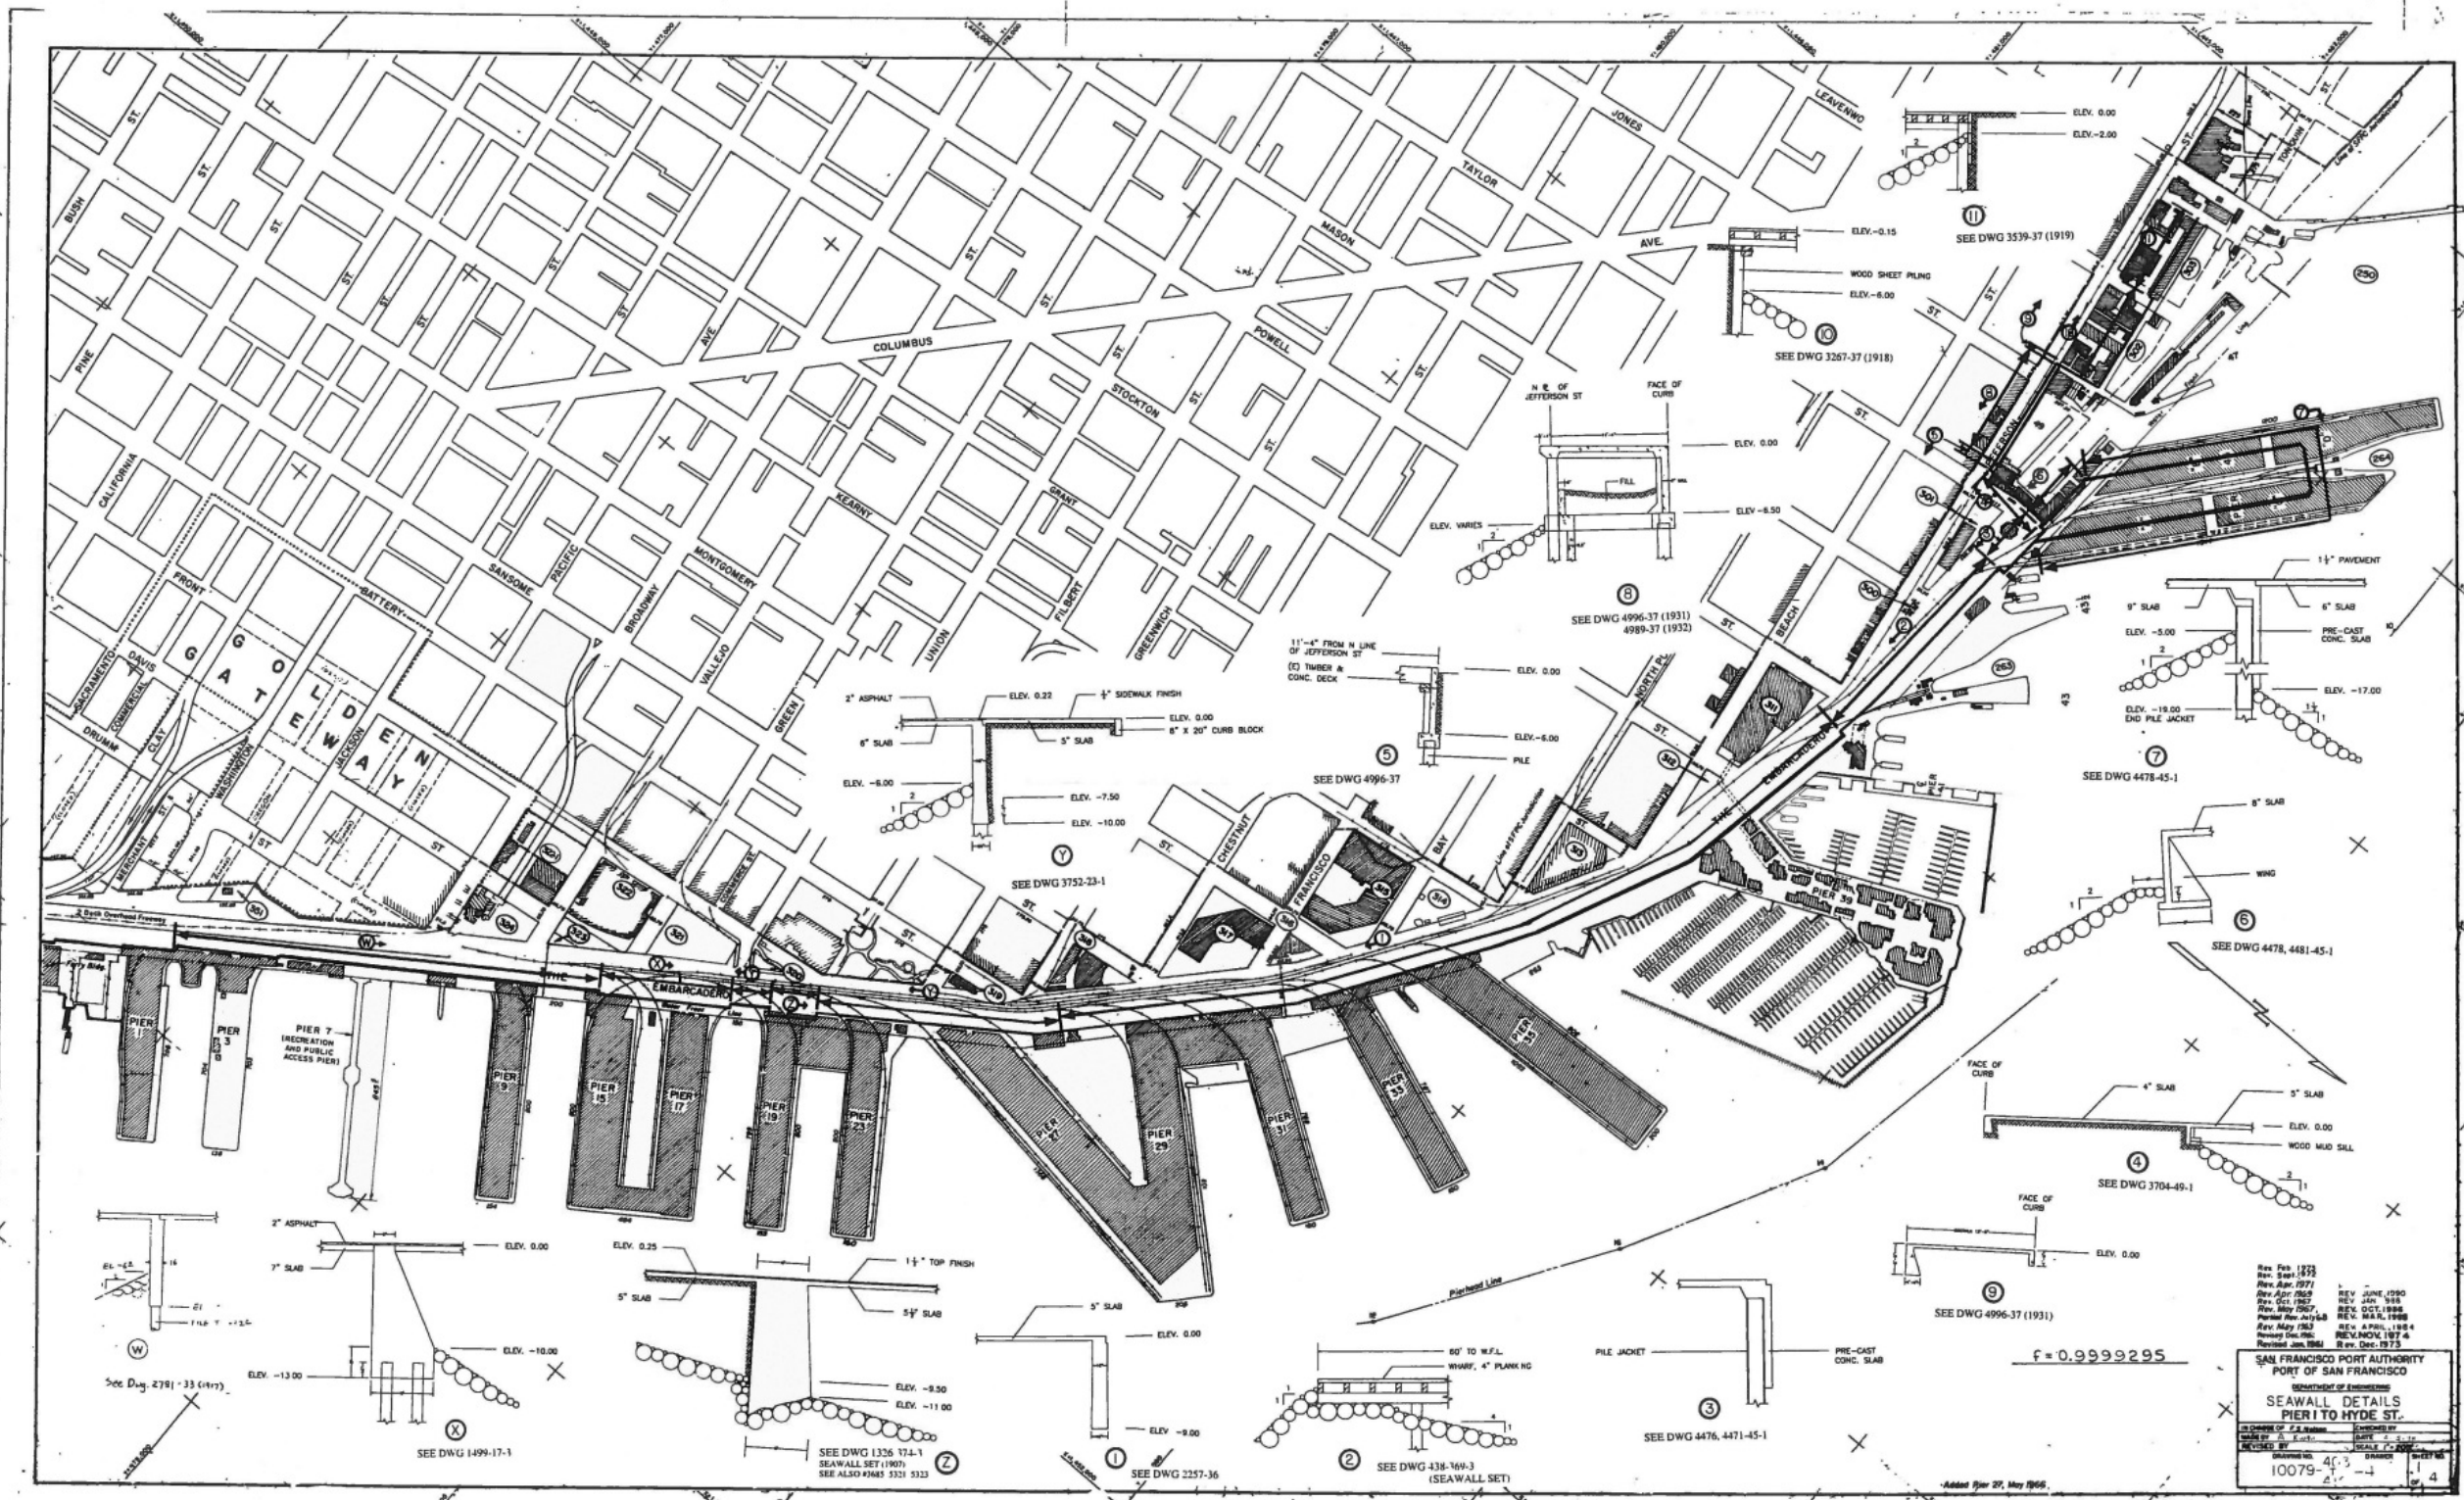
Seawall Map and Section Definition – Pier 7 to Fisherman's Wharf
